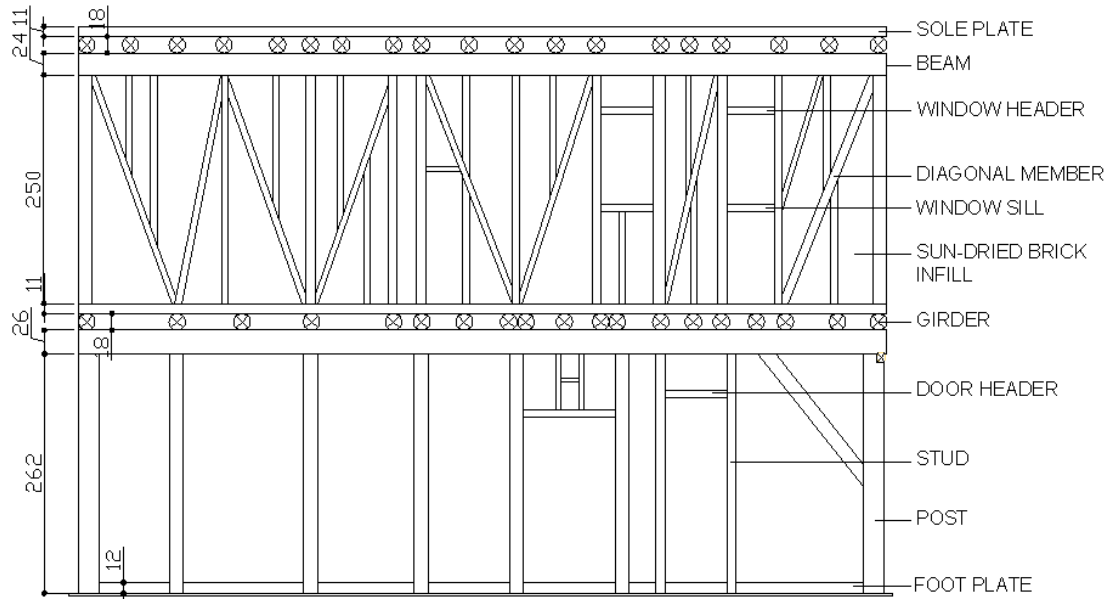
Elements of a timber-framed building in Yuva Village (House 1).
